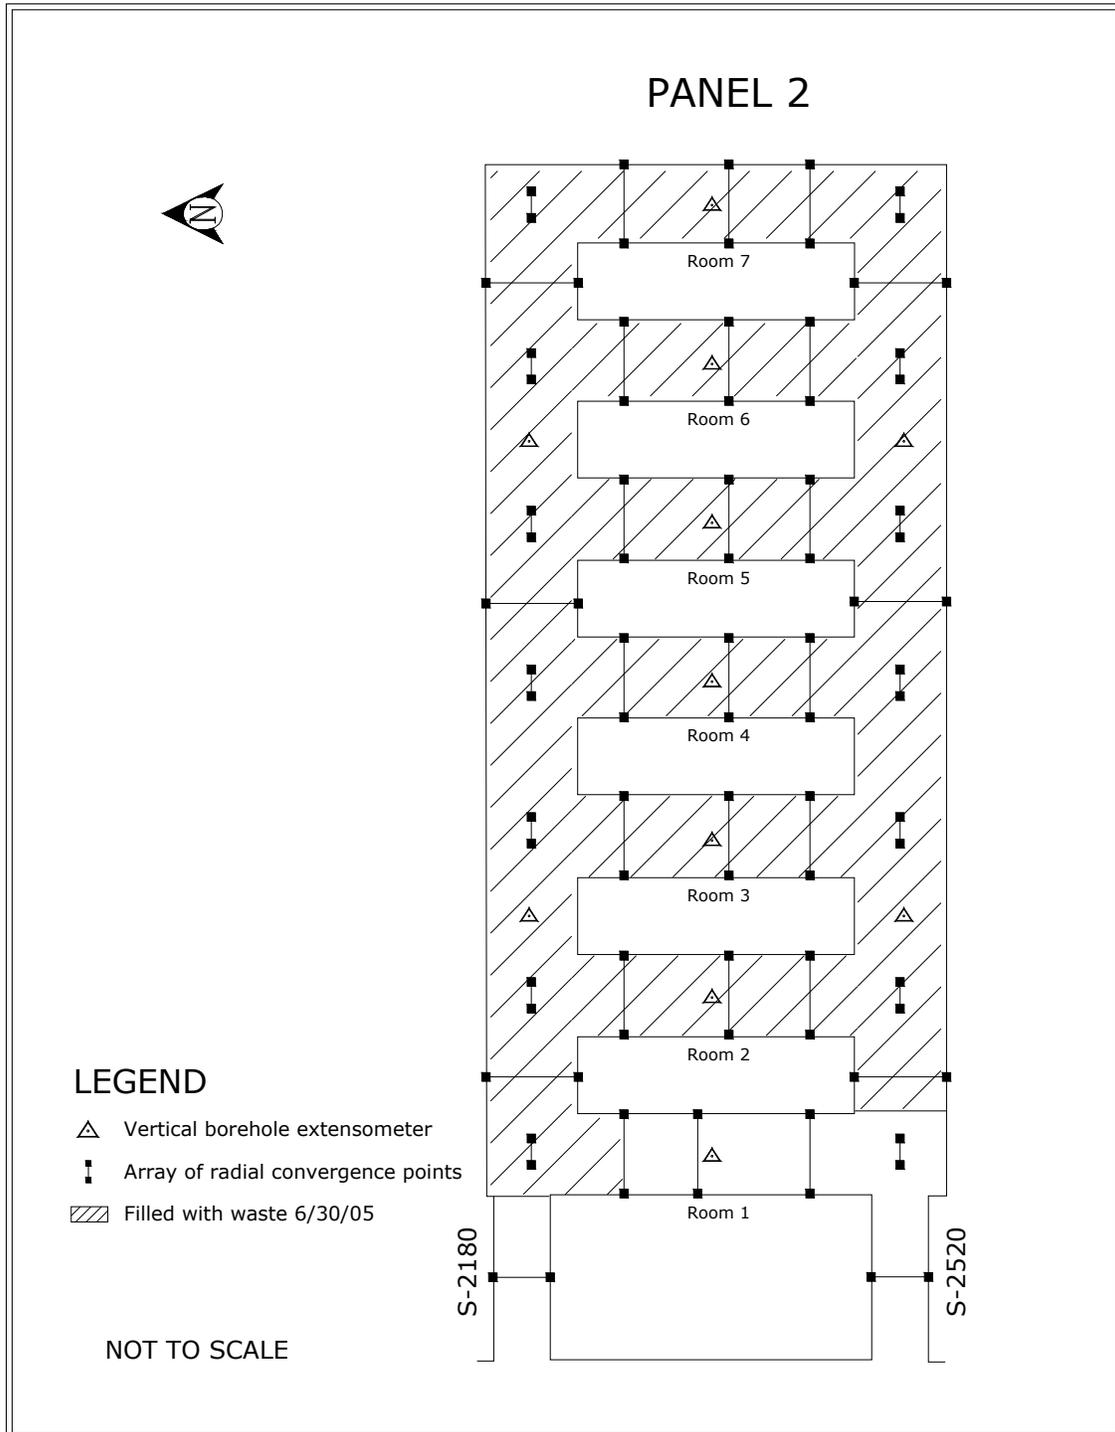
Location of Panel 2 Geotechnical Instruments
